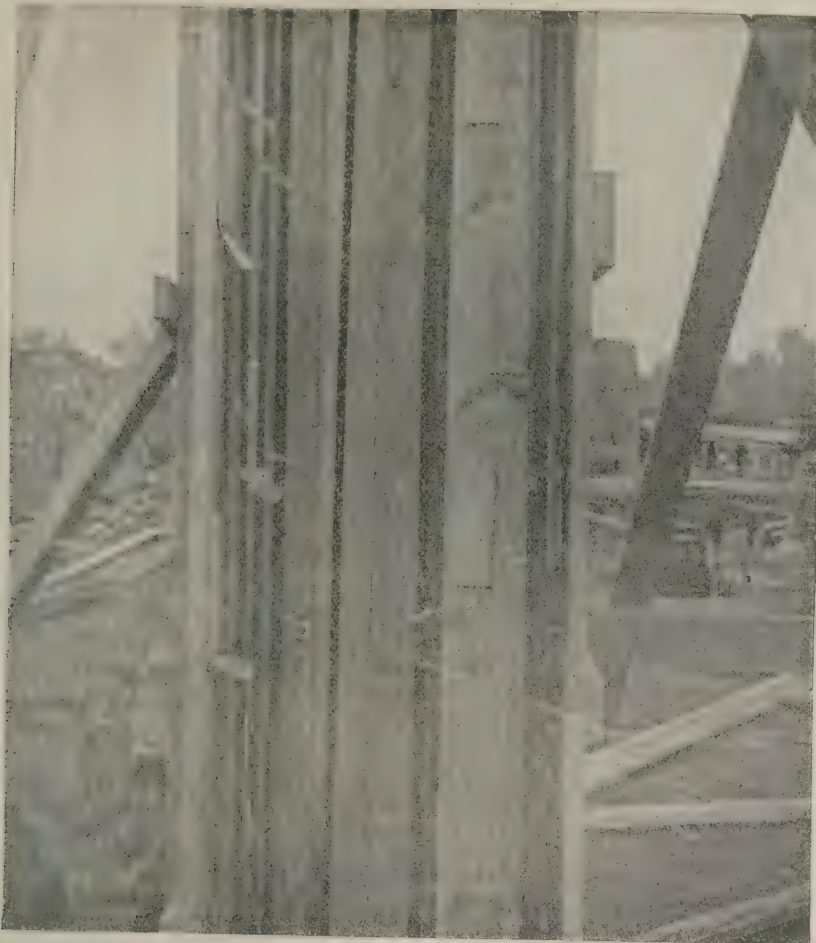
BONDING FIN IN POSITION IN FORM FOR REINFORCED CONCRETE COLUMN.
